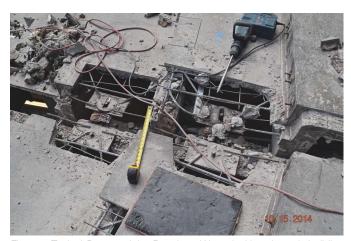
Typical Precast Joint Repairs - Water leaking through building expansion joint between precast seating sections was absorbed by mineral wool fireproofing in the joint, resulting in severe deterioration. Large steel plates are seismic restraints.
